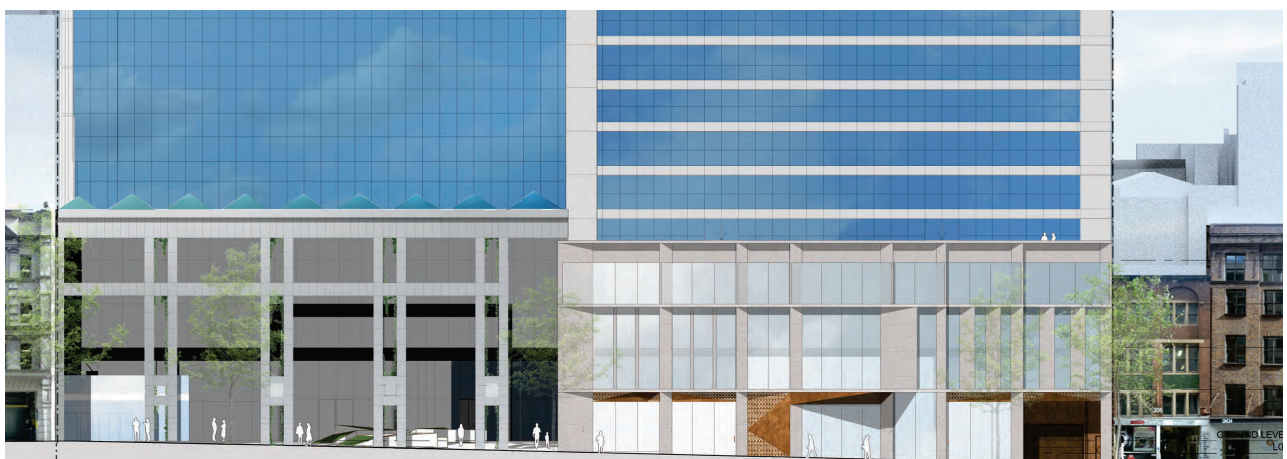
309-321 Kent Street - Approved eastern elevation
